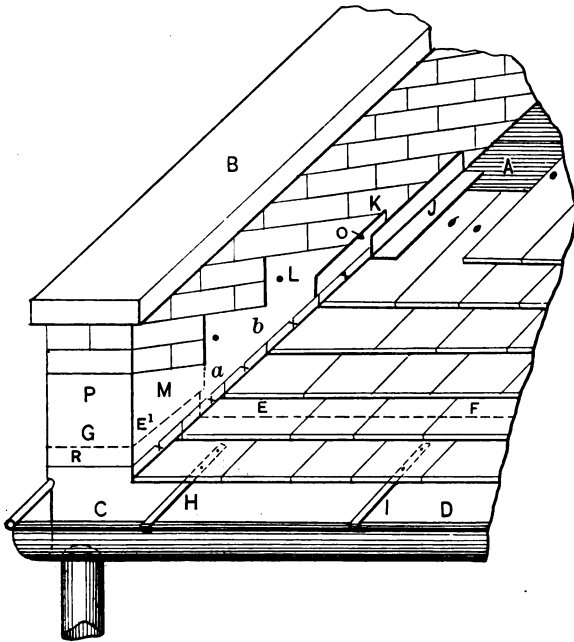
Putting in Step and Counter or Cap Flashing for Shingle or Slate Roof.
